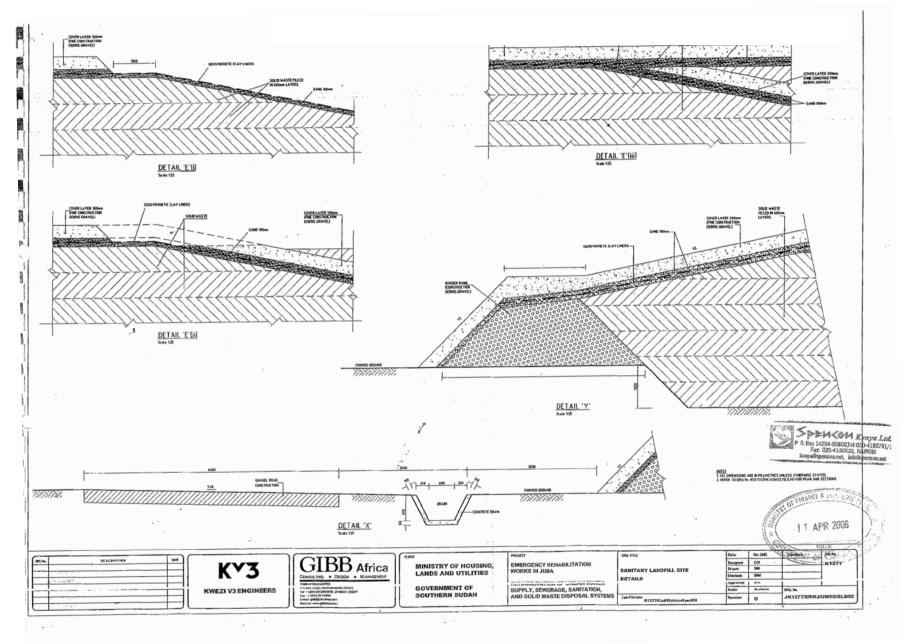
Detailed Section of Sanitary Landfill Site Designed by GOSS
